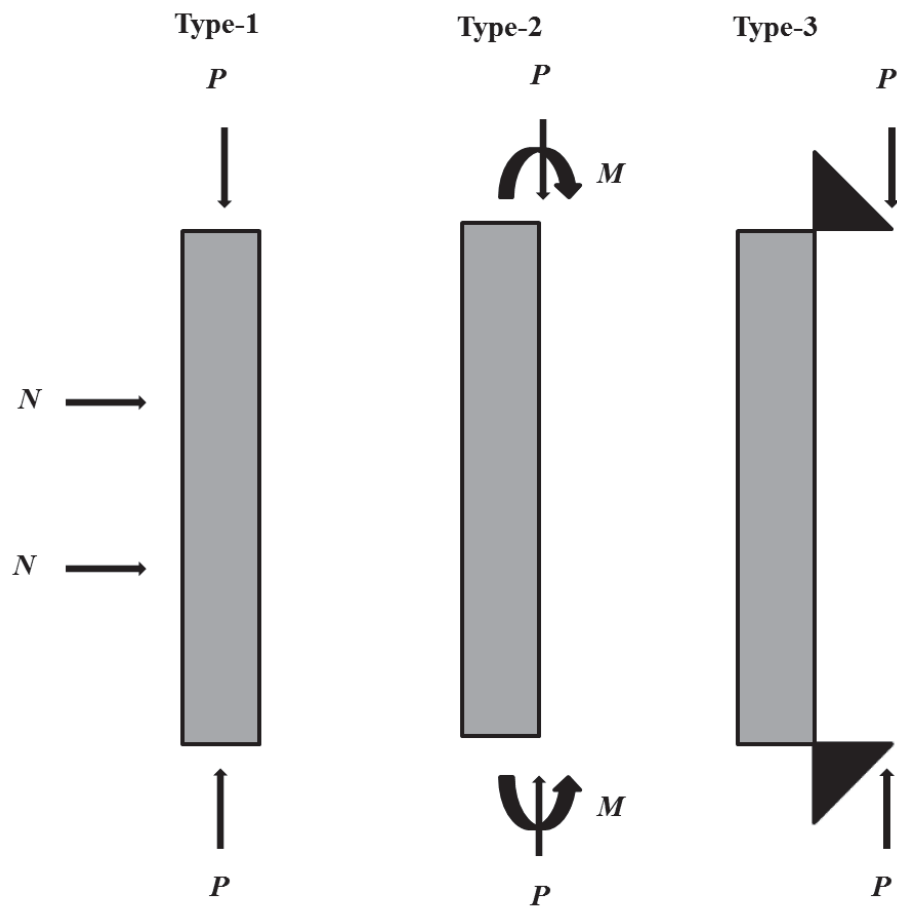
Typical Loading Schemes for CFT Beam-Column Tests
